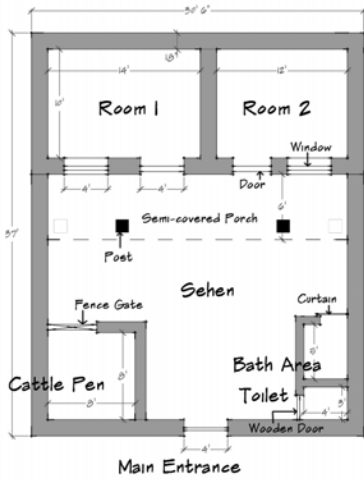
Typical adobe house in rural areas of Sindh and Punjab.
